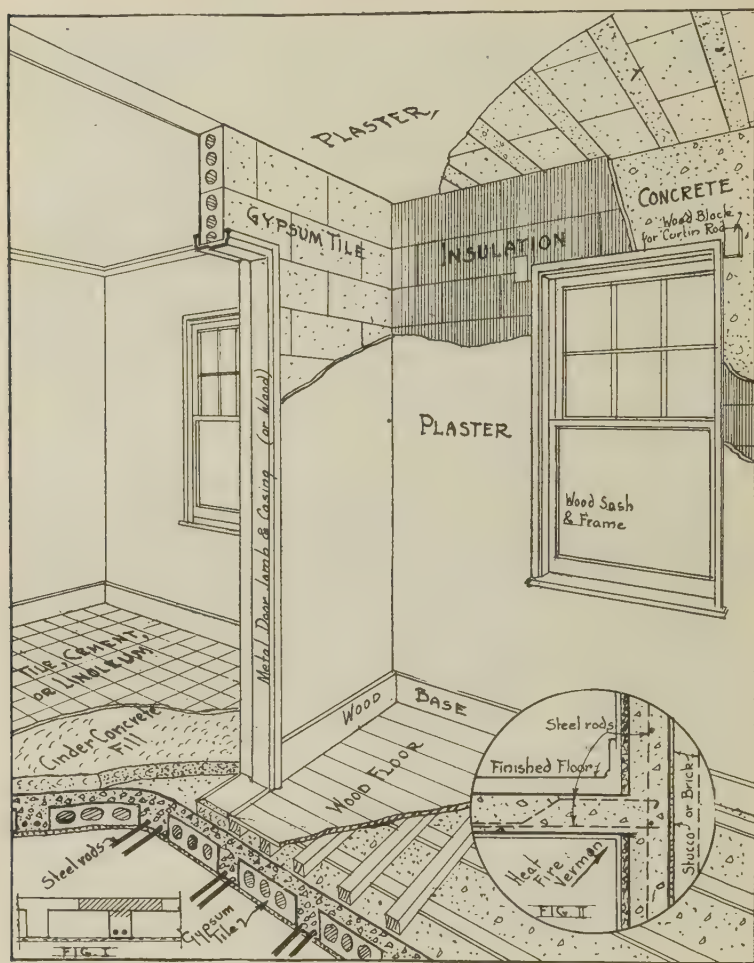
EXPOSED SECTION SHOWING CONSTRUCTION.
